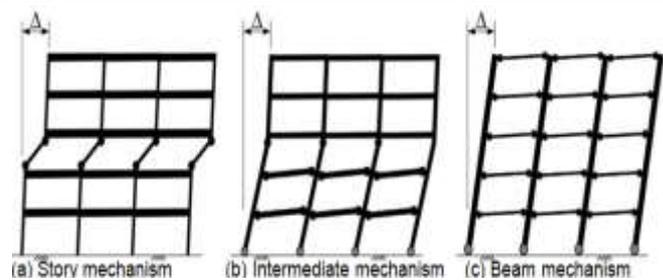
Design of Special Moment Frames aims to avoid a) Story Mechanism and instead achieve either an b) Intermediate Mechanism or c) Beam Mechanism.
